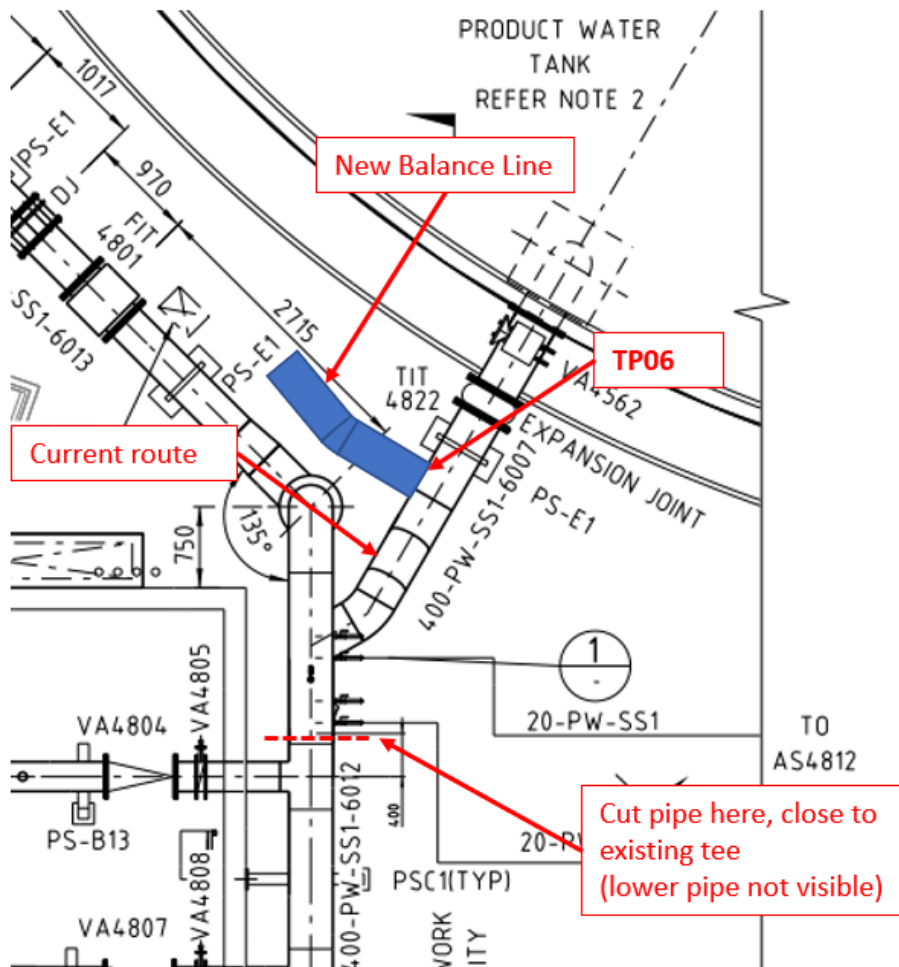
TP06 - Sketch of existing (ref. Drawing No. 15270-620)
